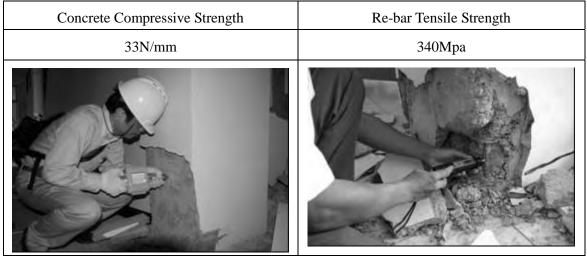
Field Materials Strength Testing by Nondestructive Testing Method
